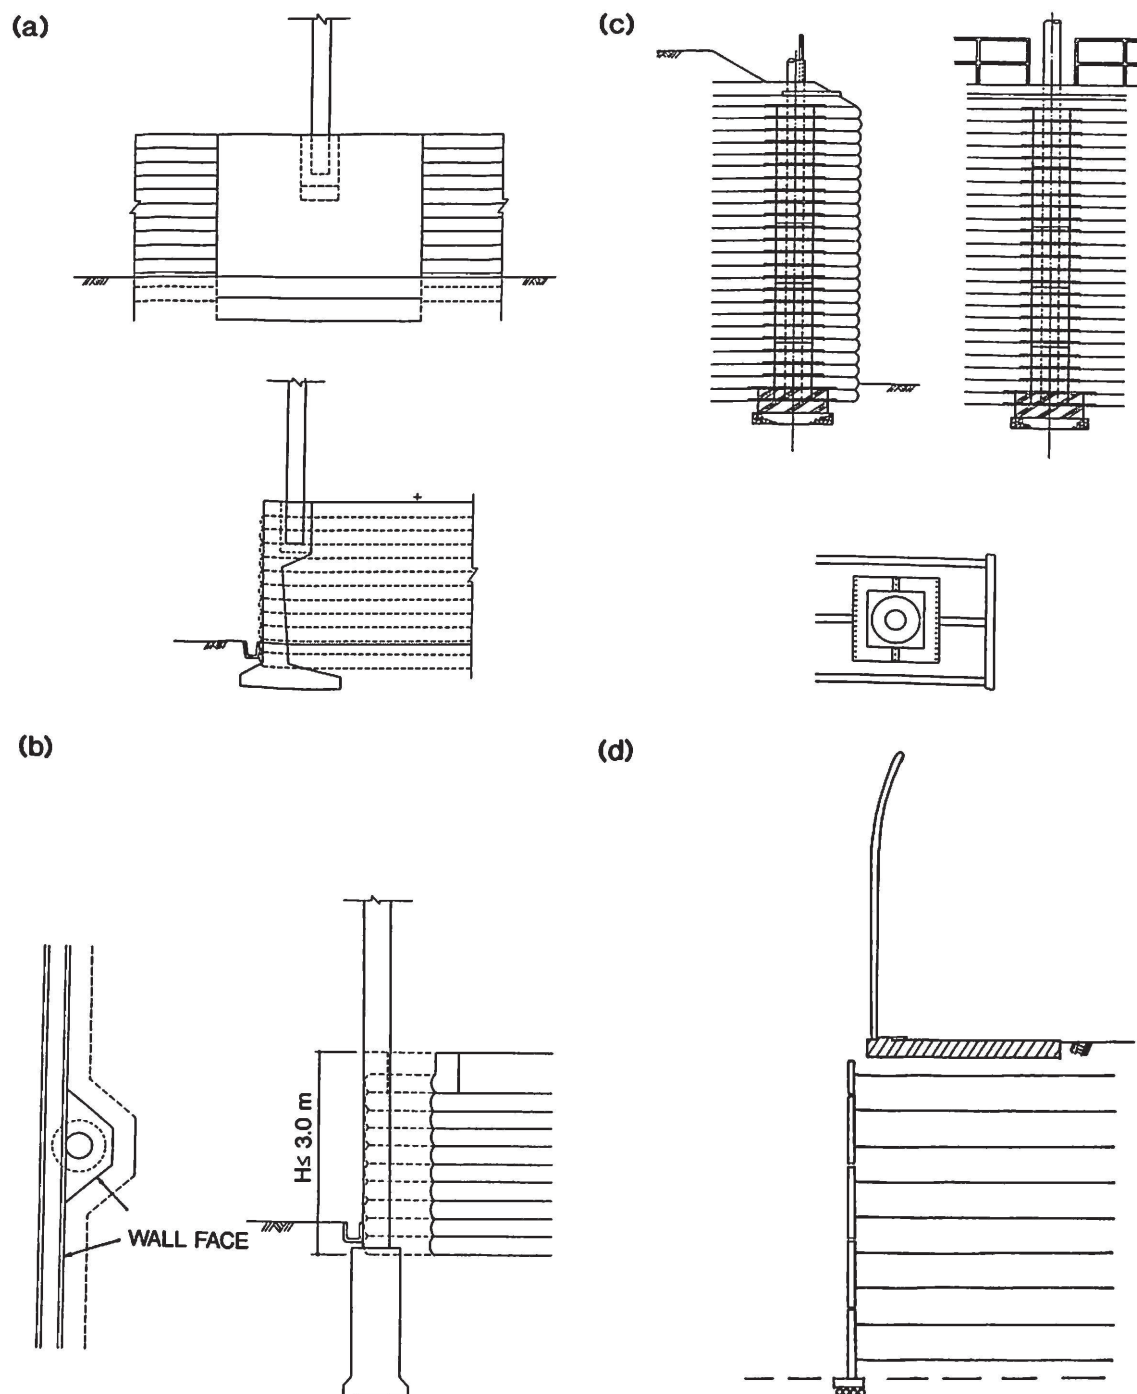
Some examples of Terre Armée walls to accommodate a foundation of structure
